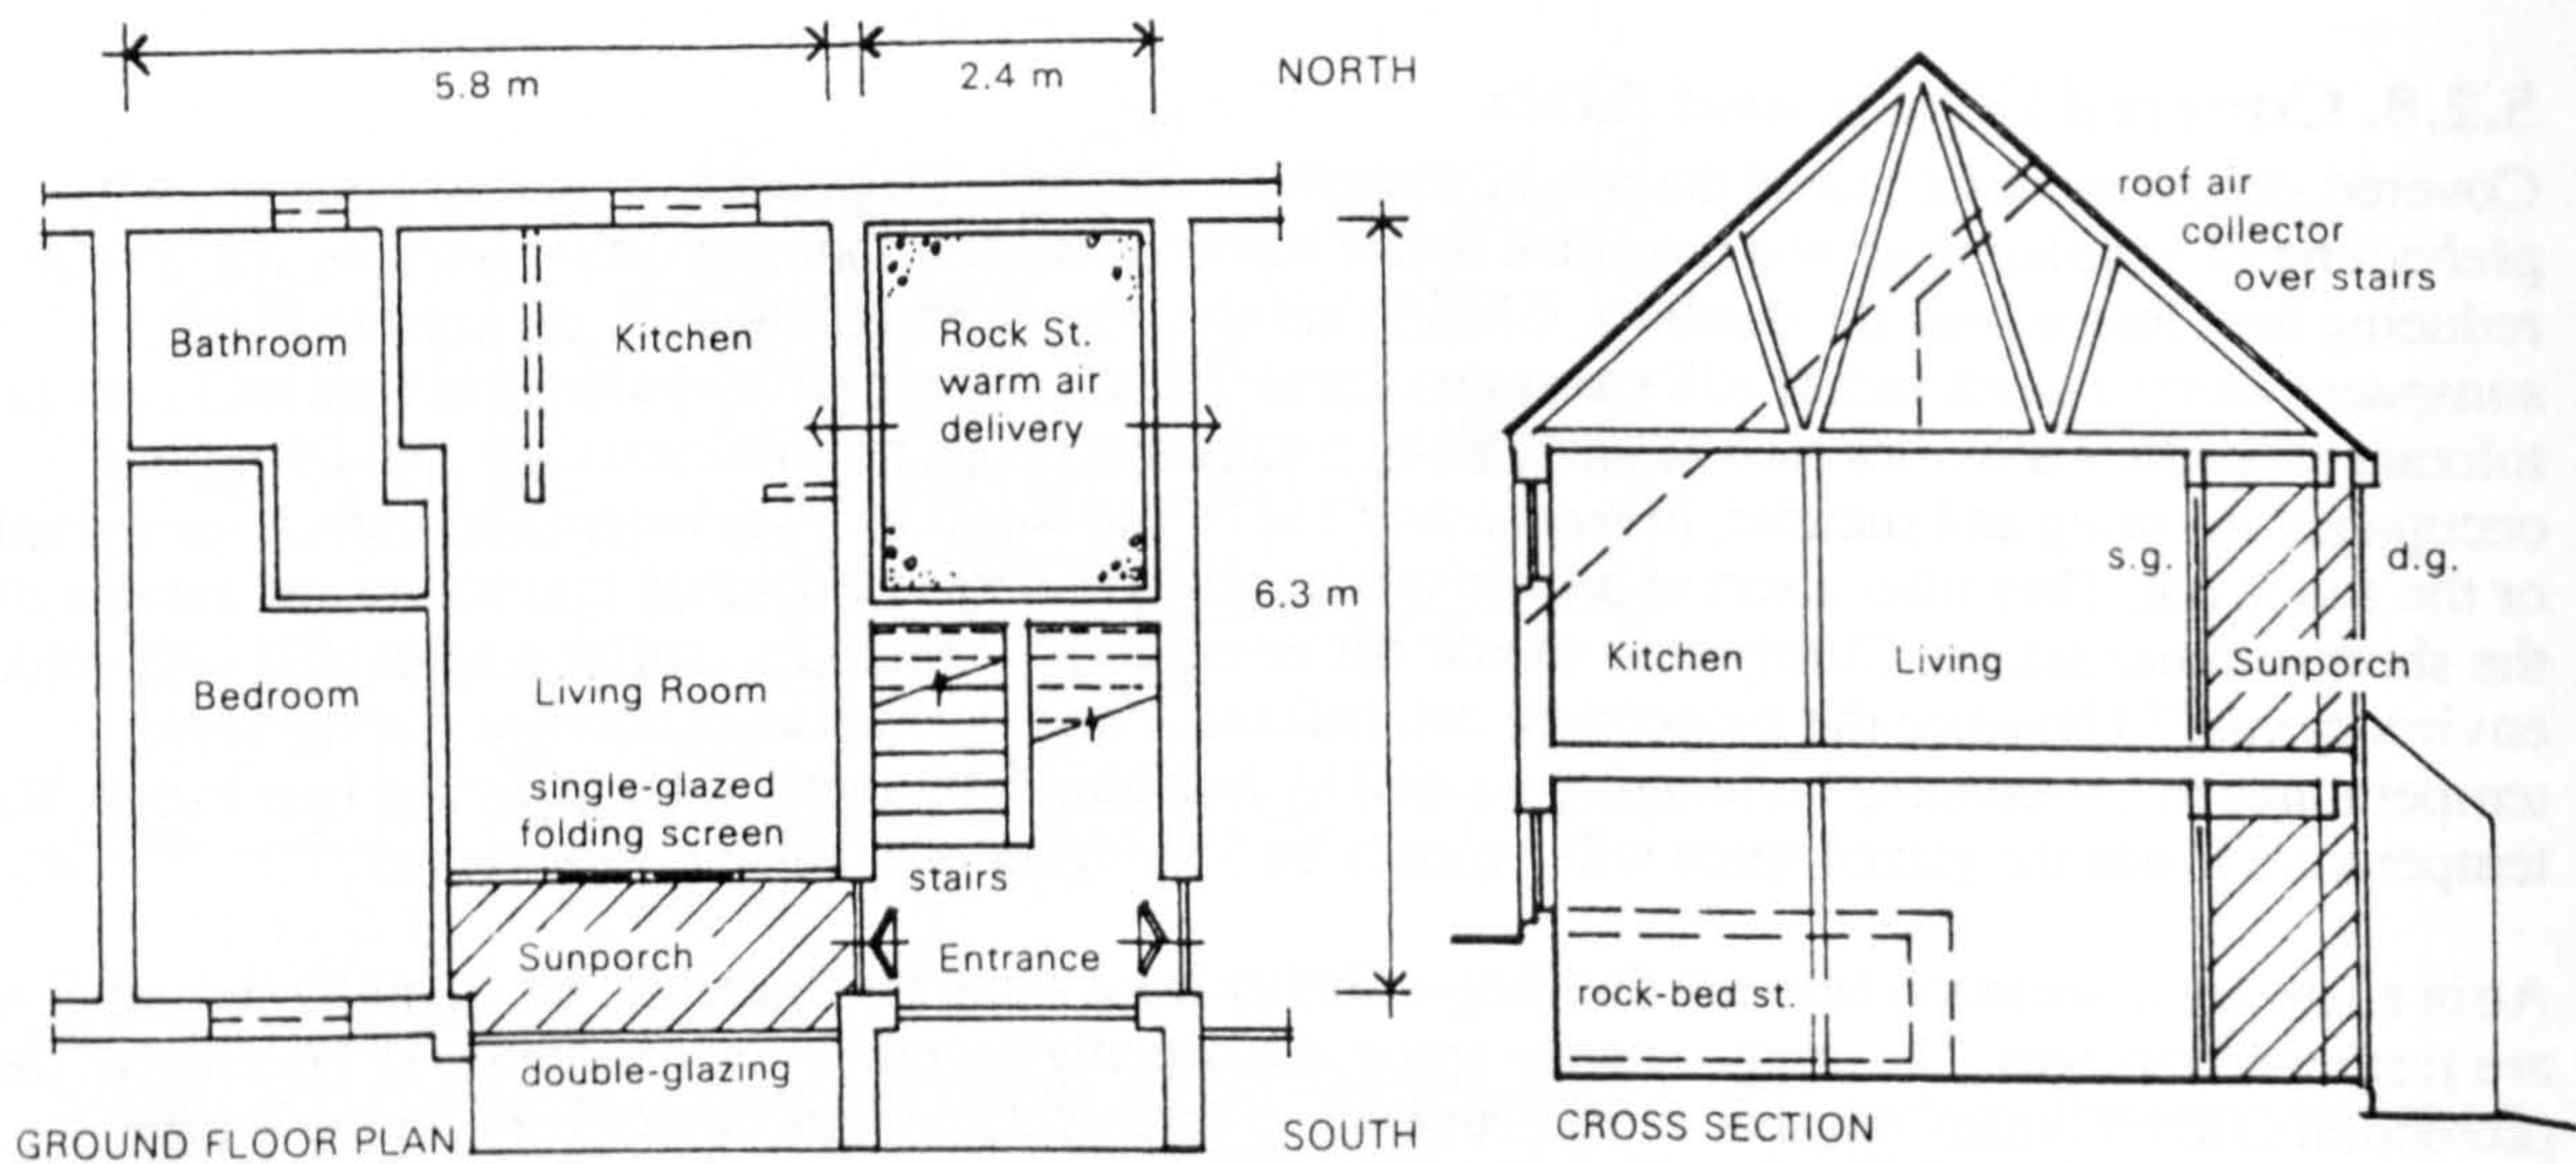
Plan and section of single person flat, Stornoway<sup>103</sup>
